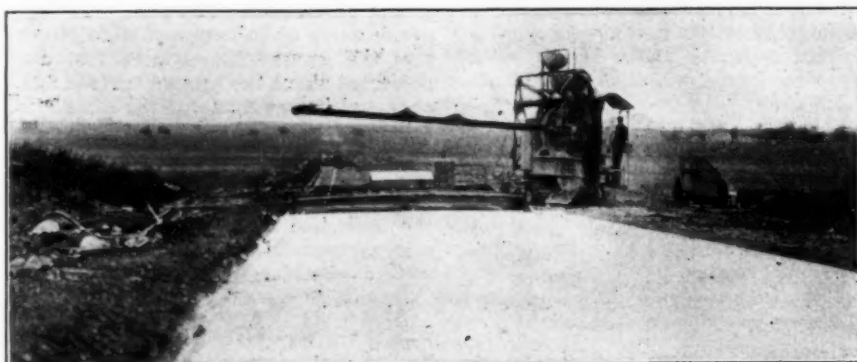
View at Paver, Showing Machine off Subgrade Being Paved, Looking Toward Grading Equipment. Prepared Subgrade not Disturbed in any Manner Ahead of the Paver
